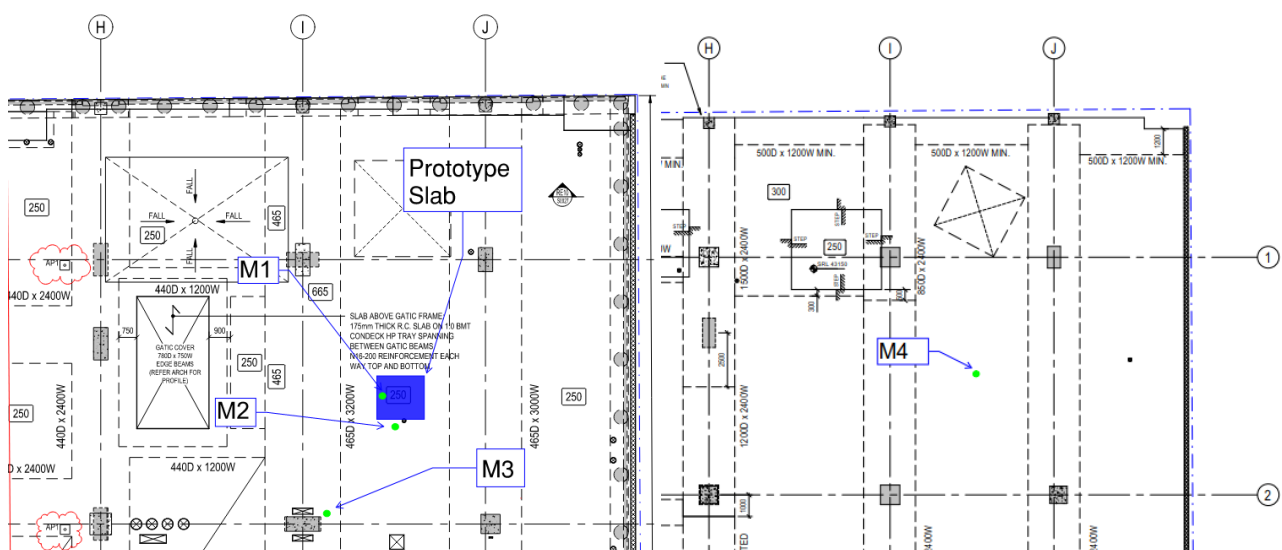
Measurement locations on the ground floor (left) Measurement locations on the 2<sup>nd</sup> floor (right).
